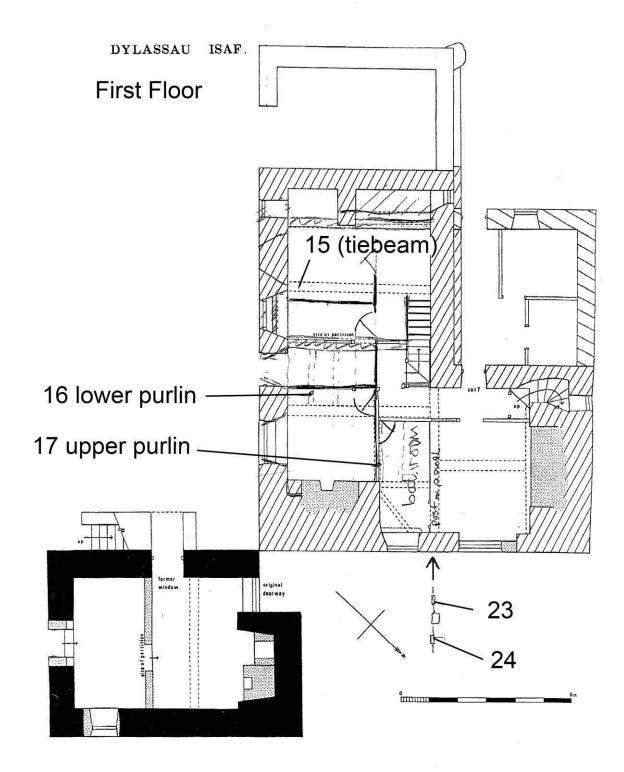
Plan of the First Floor of the property showing the timbers sampled (adapted from drawings supplied)
